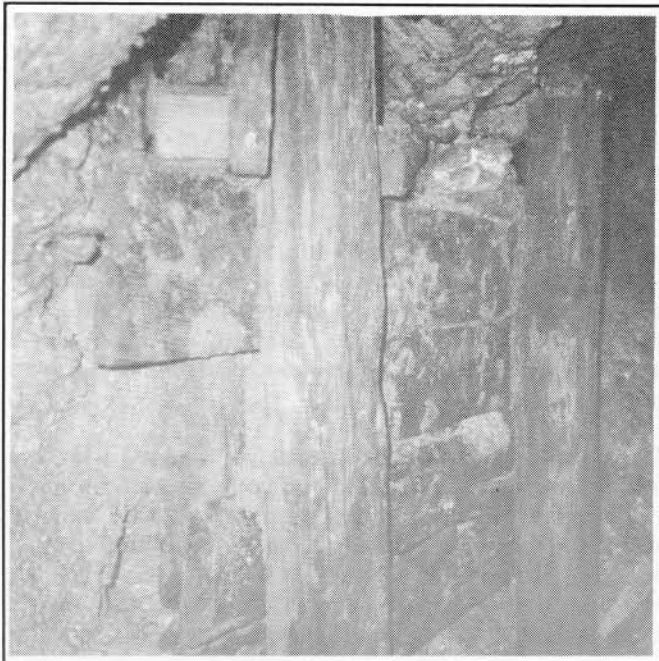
Wooden wall bracing in Glen Auldyn north adit.
